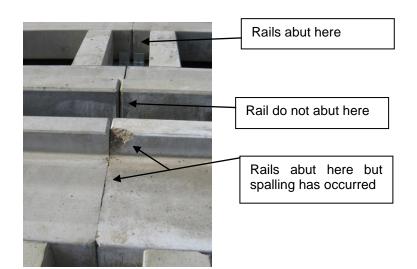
Photograph of guiderails not abutting, and spalling in a location where they do abut.
